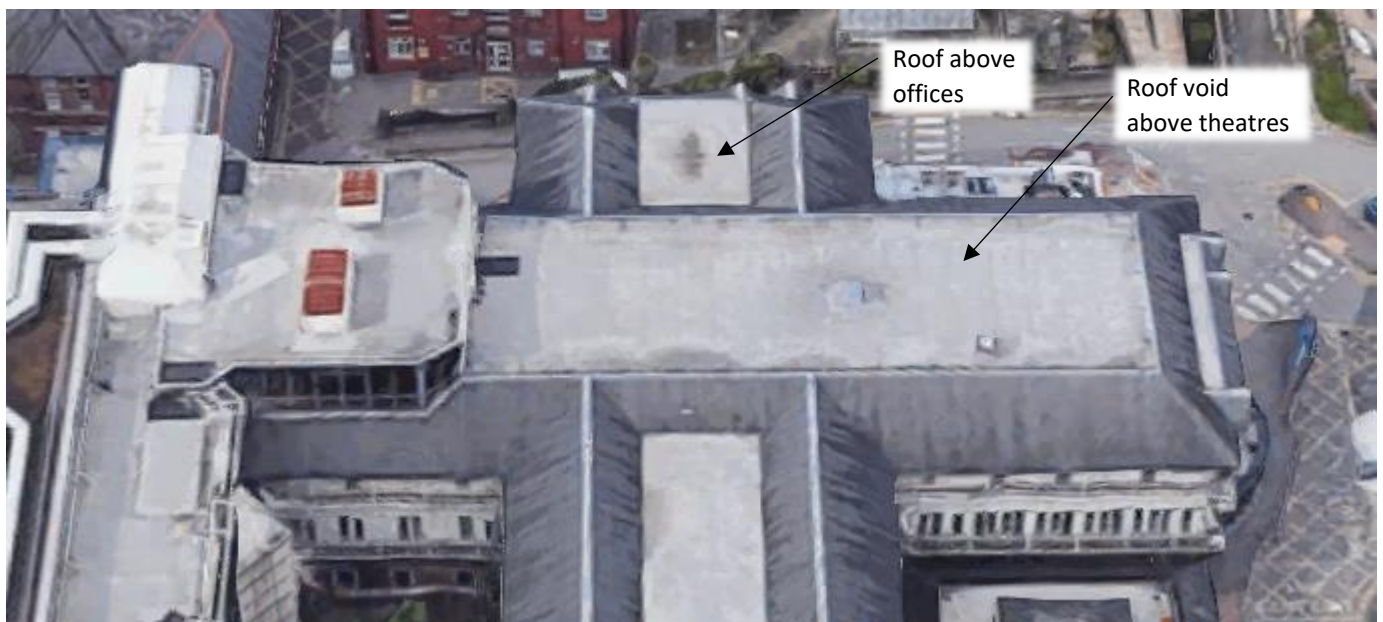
TYPICAL ARRANGEMENT, BLOCK A
